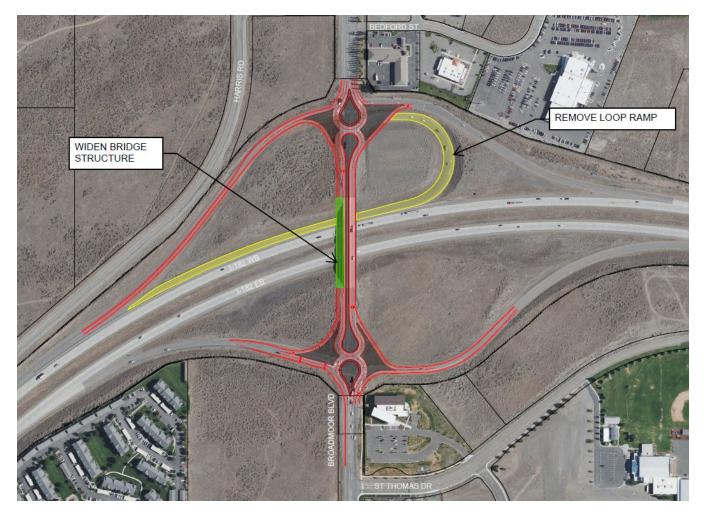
ALTERNATIVE C-P-3 (DDI WITH ROUNDABOUTS) CONCEPTUAL LAYOUT
